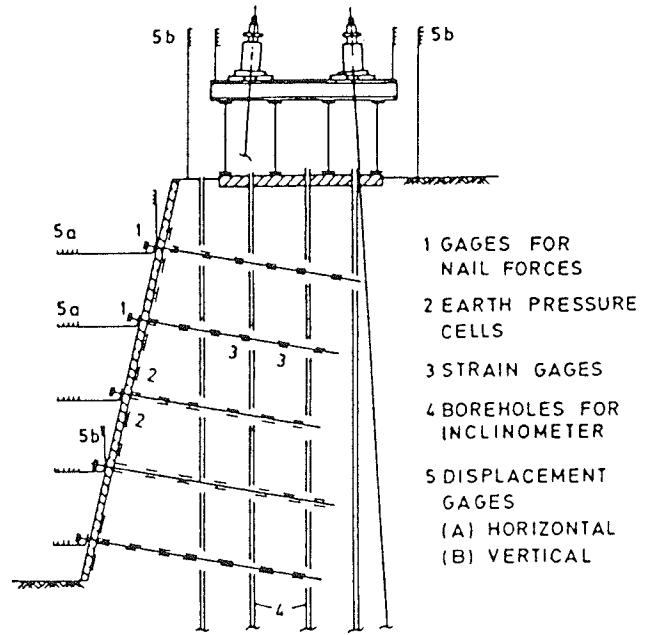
Measuring facilities of the test walls. [Gassler and Gudehus, 1981]
